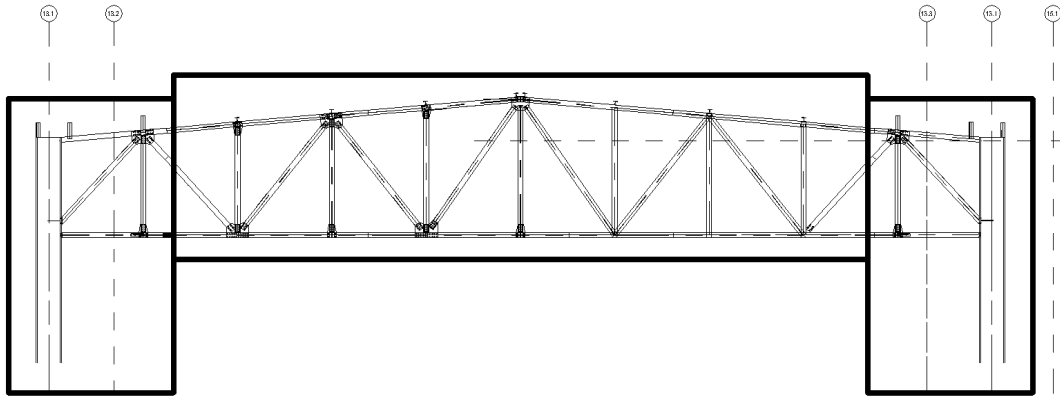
Typical cross section of the roof truss (by Subcontractor)
